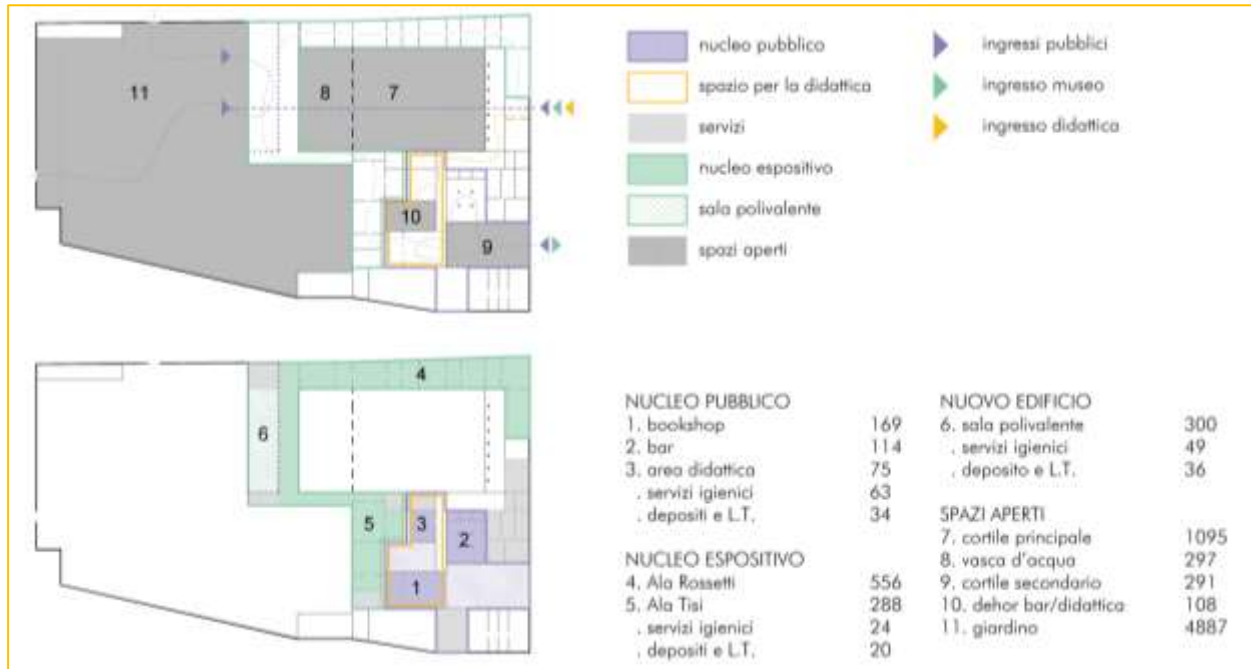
Zoning Analysis for ground floor plan (above), first floor plan (below) for Palazzo dei Diamanti Museum.
